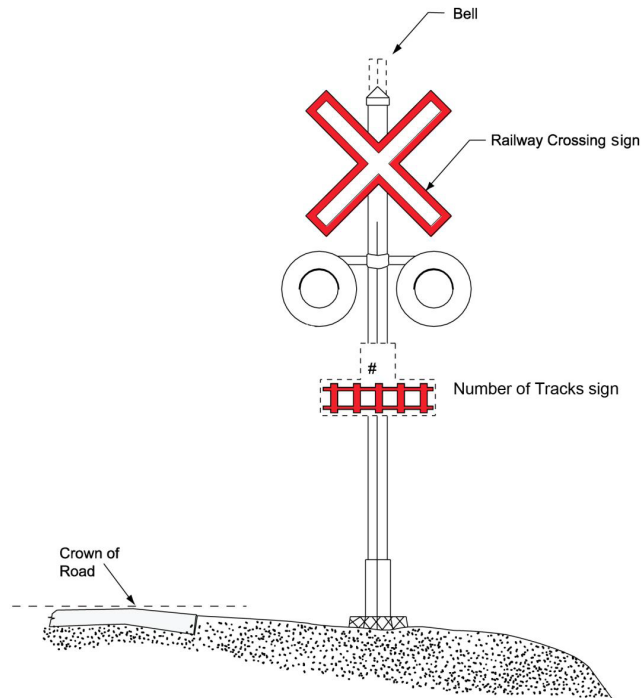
Railway Crossing Sign and Number of Tracks Sign on a Grade Crossing Warning Signal of Flashing Light Type
